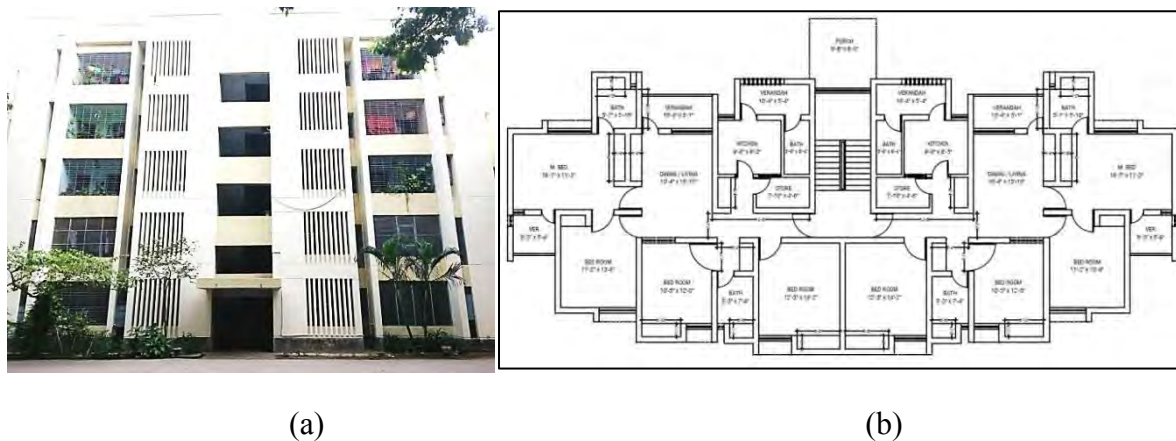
(a) Front View and (b) Plan of Building No.46
